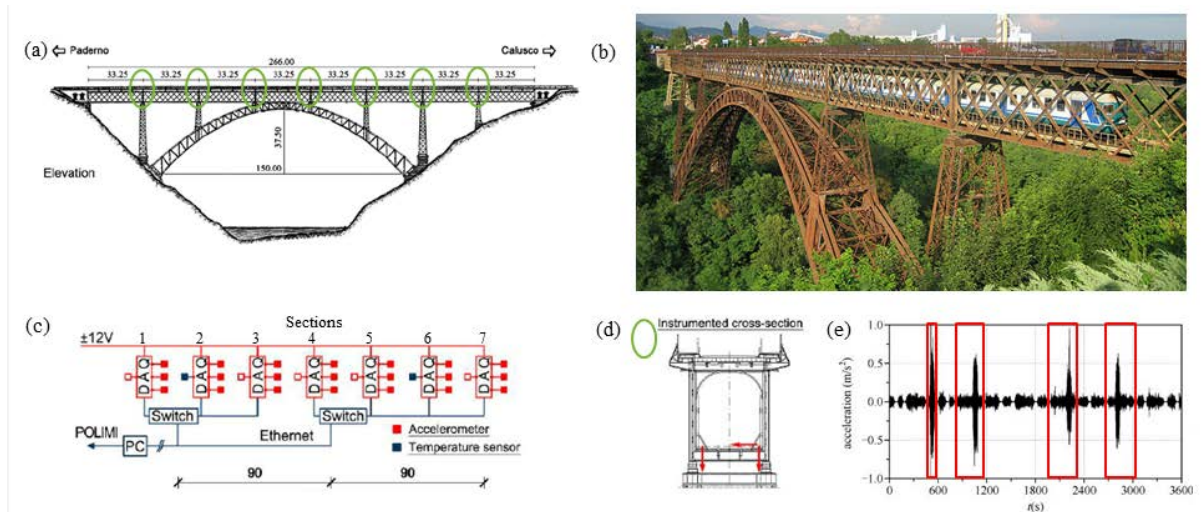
(a) Elevation of San Michele Bridge, (b) combined railway and road traffic, (c) layout of the installed monitoring system, (d) typical instrumented cross-section and (e) sample of one hour long acceleration record and extraction of signals associated to railway traffic (each red rectangle represent an extracted signal) [9-10].
